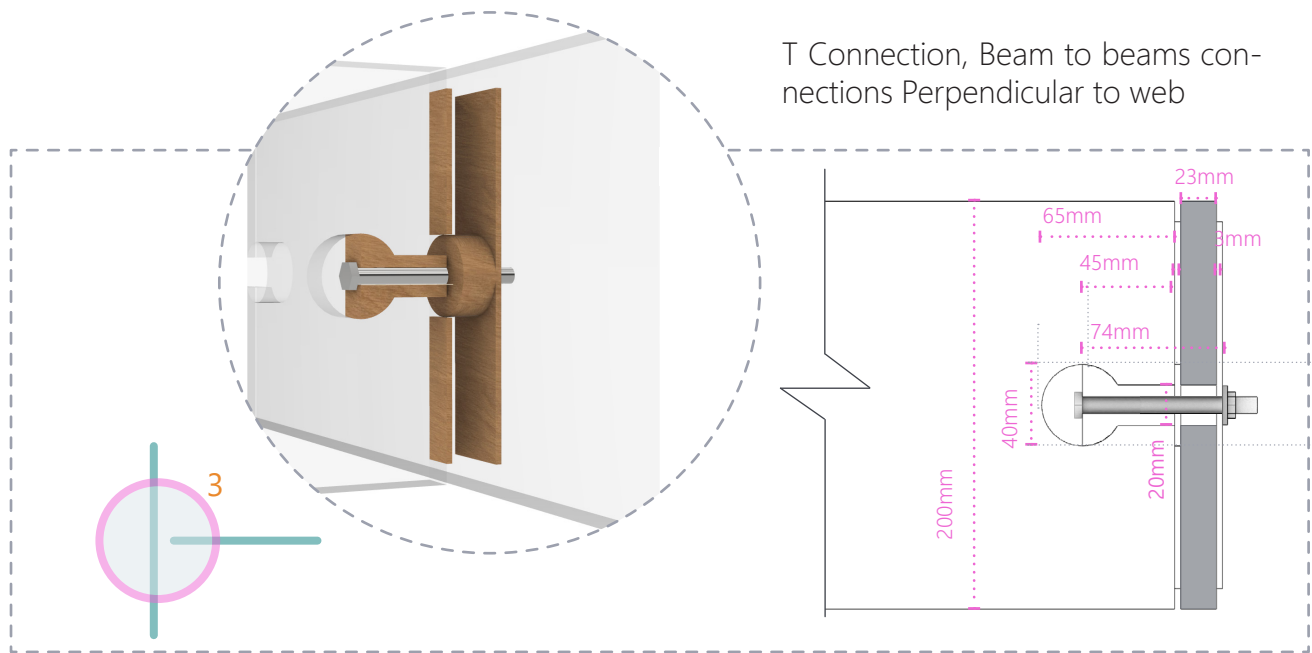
to 68, Connection detail drawings and diagrams, Source: Author's own
